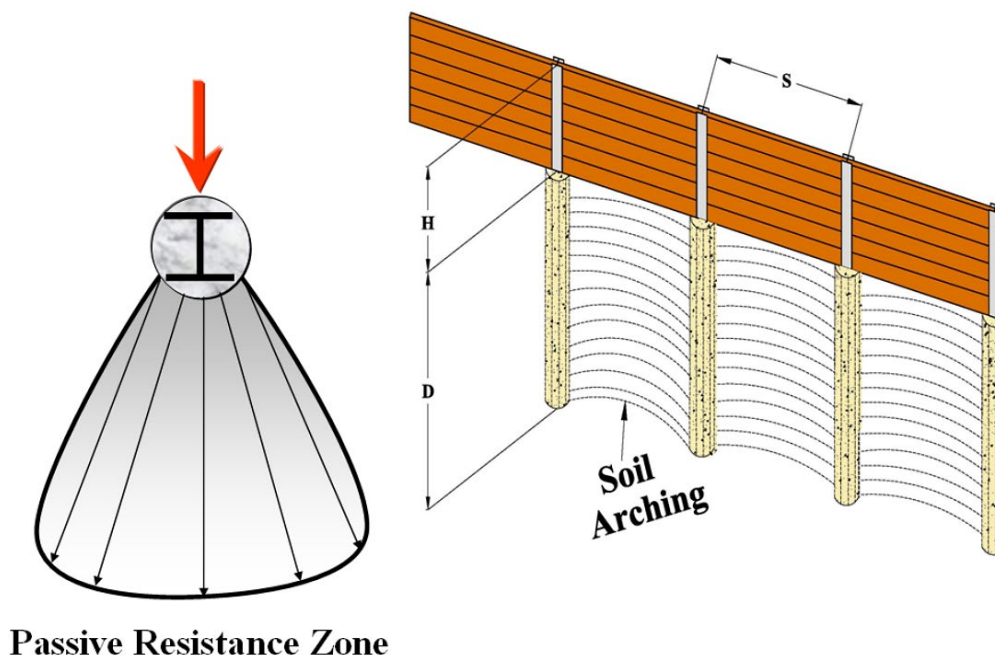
Soldier Pile Wall with Cap Beam
